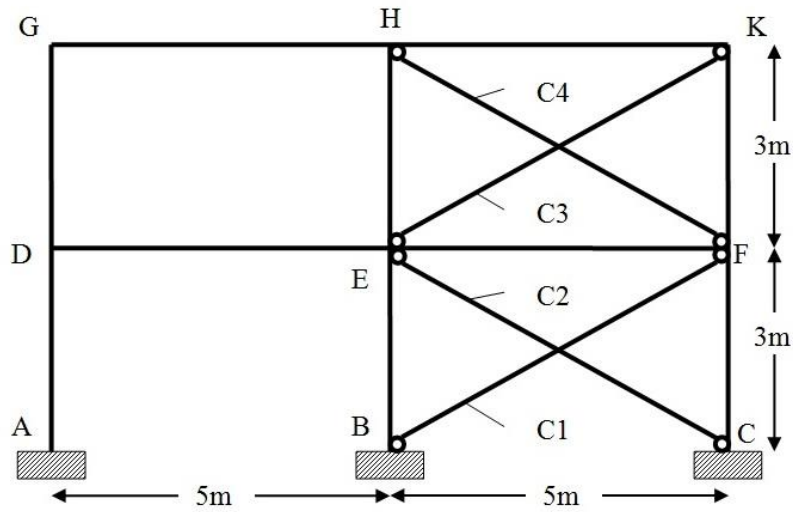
System F2: the industrial RC frame cable-strengthened with x-bracings
